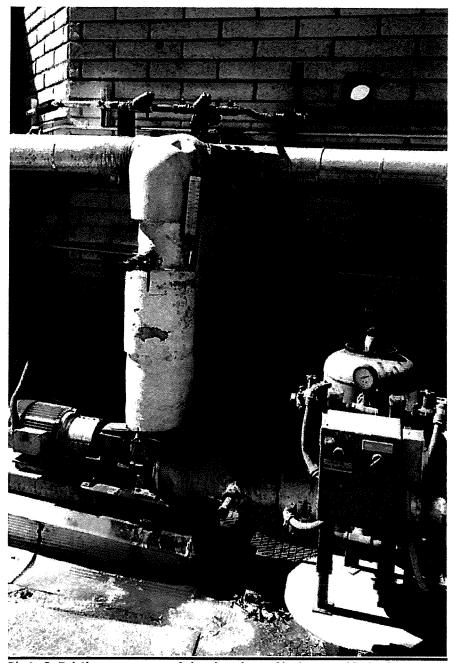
Existing pump on roof showing signs of leakage and lack of water treatment equipment. Backflow preventer for make-up water to the chilled water system can be seen above pump.
